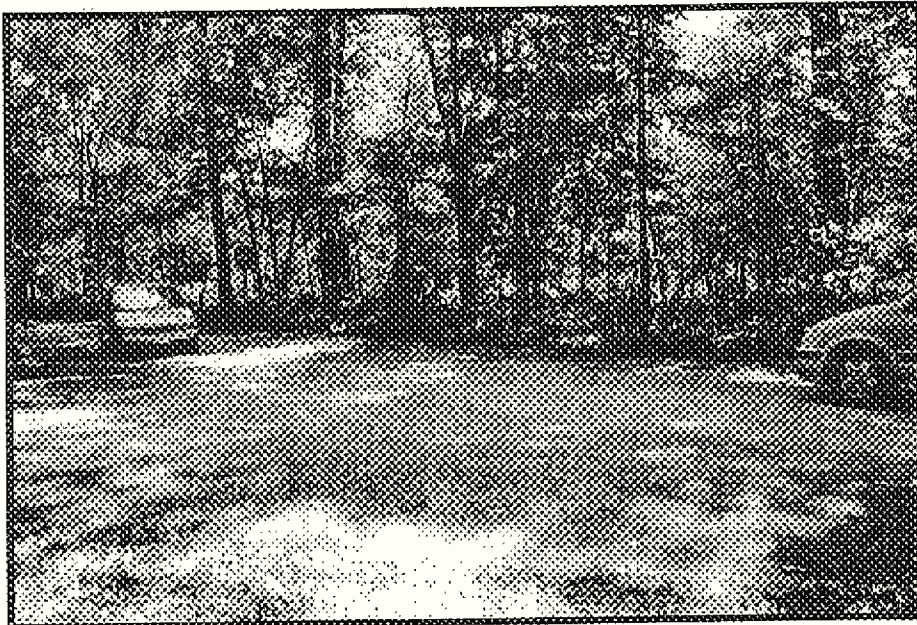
MP 0.52 Intersection with route 030 on 1-way loop
